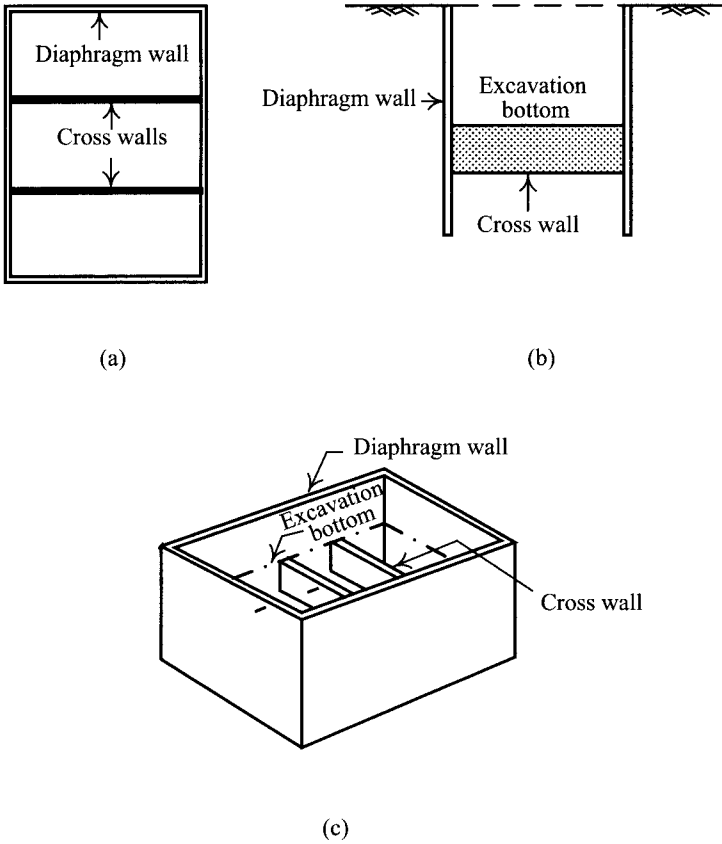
Configuration of cross walls: (a) plan, (b) profile, and (c) three-dimensional view.
